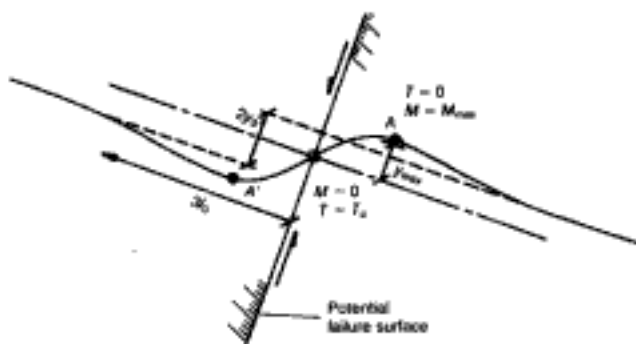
Distortion of a flexible, long nail at the failure surface (Schlosser et al.¹¹)
